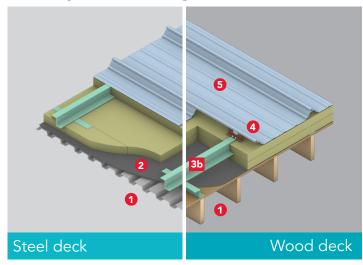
Structural metal roof panel system over insulation fitted between thermally broken framing, over steel or wood decking
